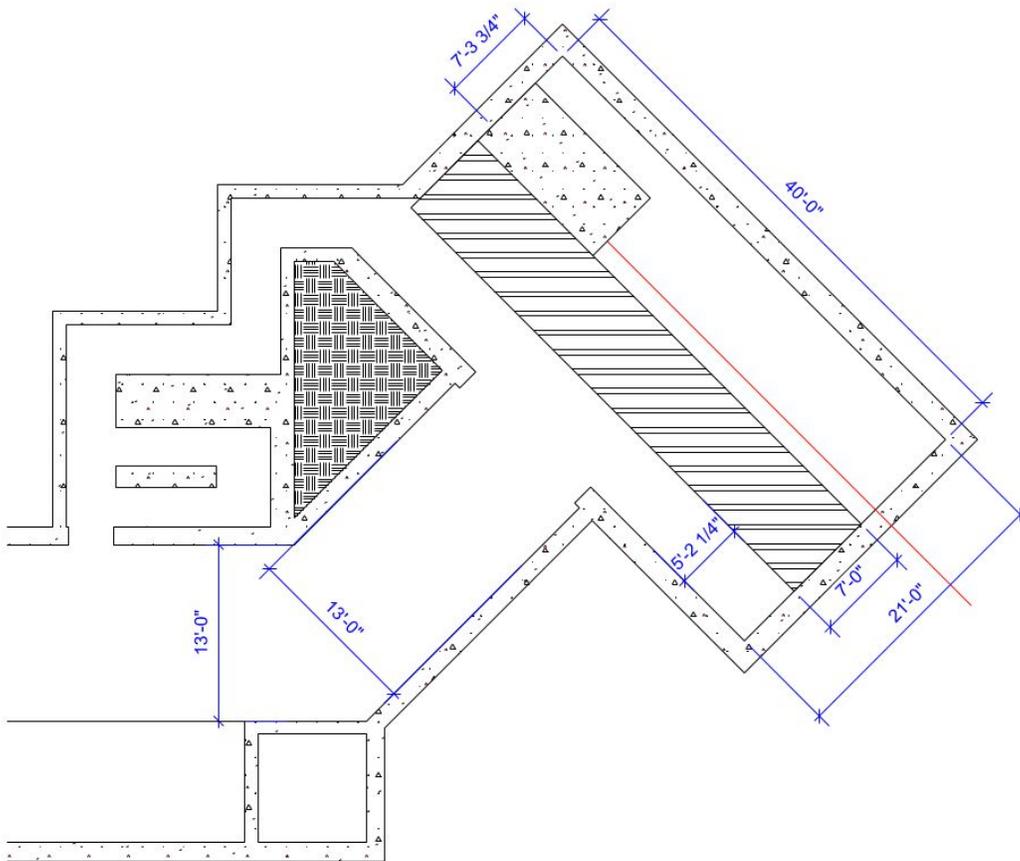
External shielding block removed and an internal shielding wall, 7' of iron, extended the full 40' length of the experimental enclosure. A beam loss accident from the bottom, right-most point on the red beam line would reach a point at the far side of the roll up door without passing through as much attenuating distance and shielding as the original shielding block pile provides.
